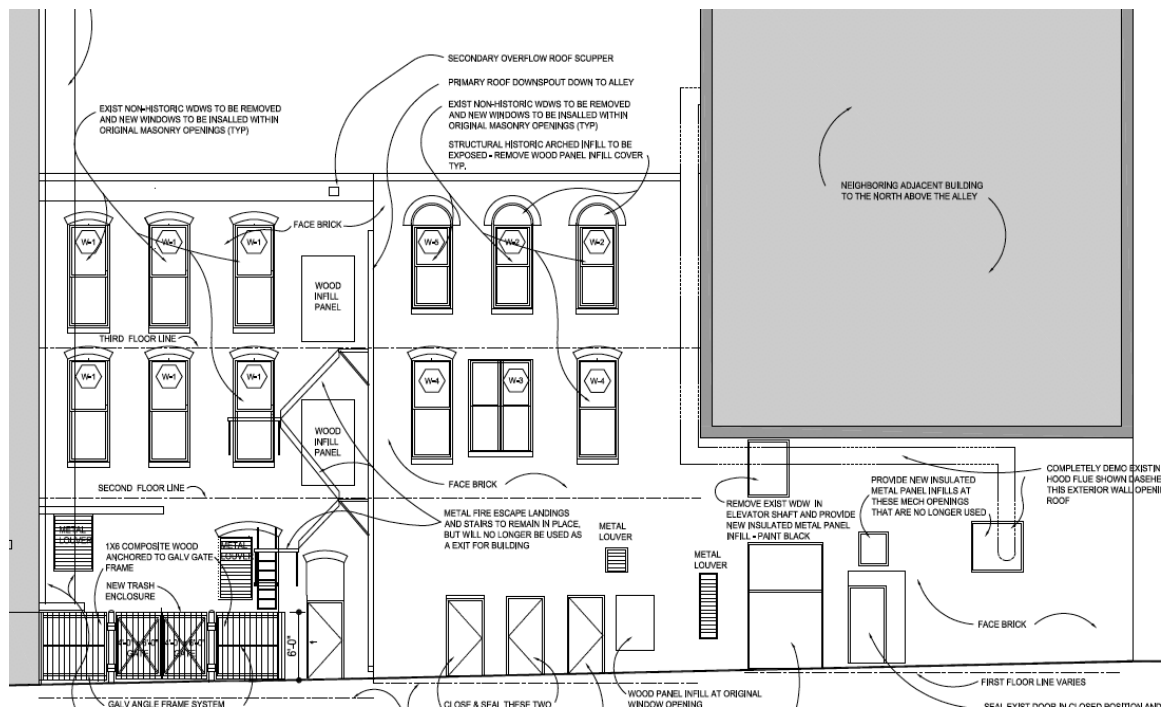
& 18. Rear elevation. East bay at left and center bay at right; far west bay is covered by neighboring building.
